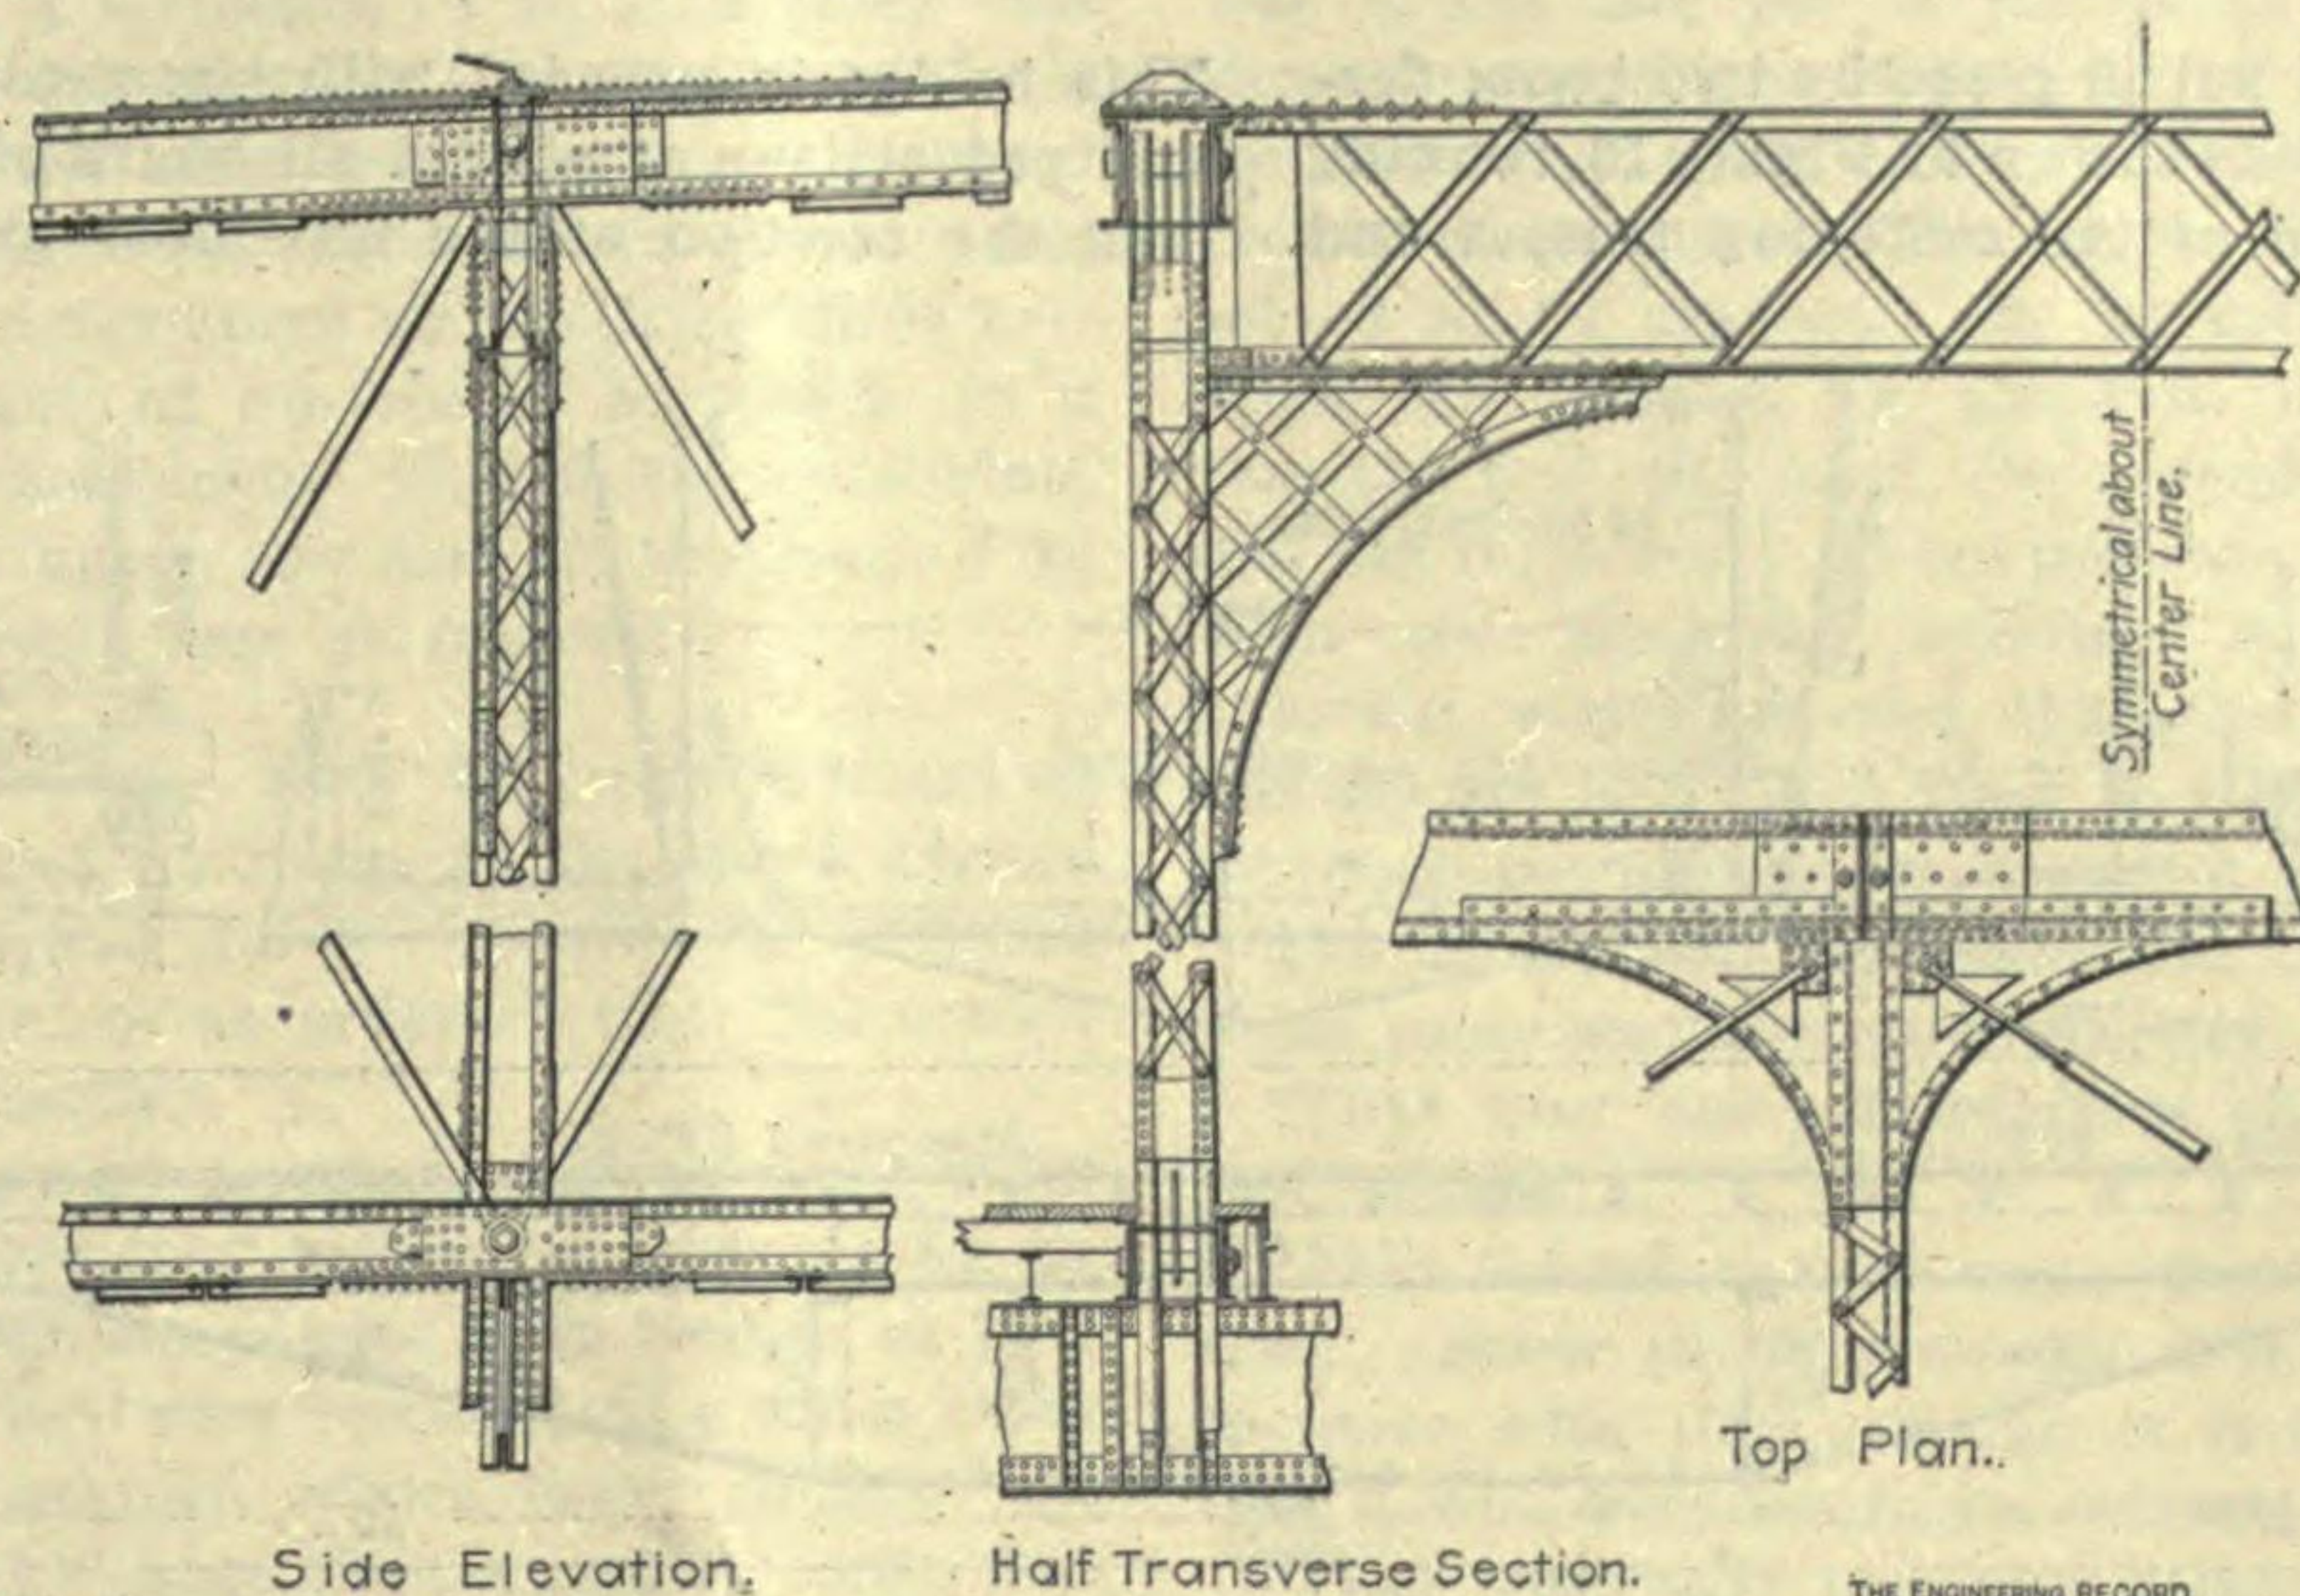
CONNECTIONS OF THE STIFFENING TRUSS.
